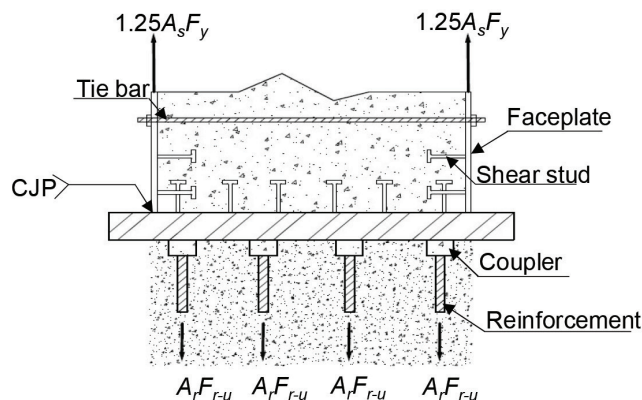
Full-strength connection between SC wall and concrete foundation (Kurt, 2016).
